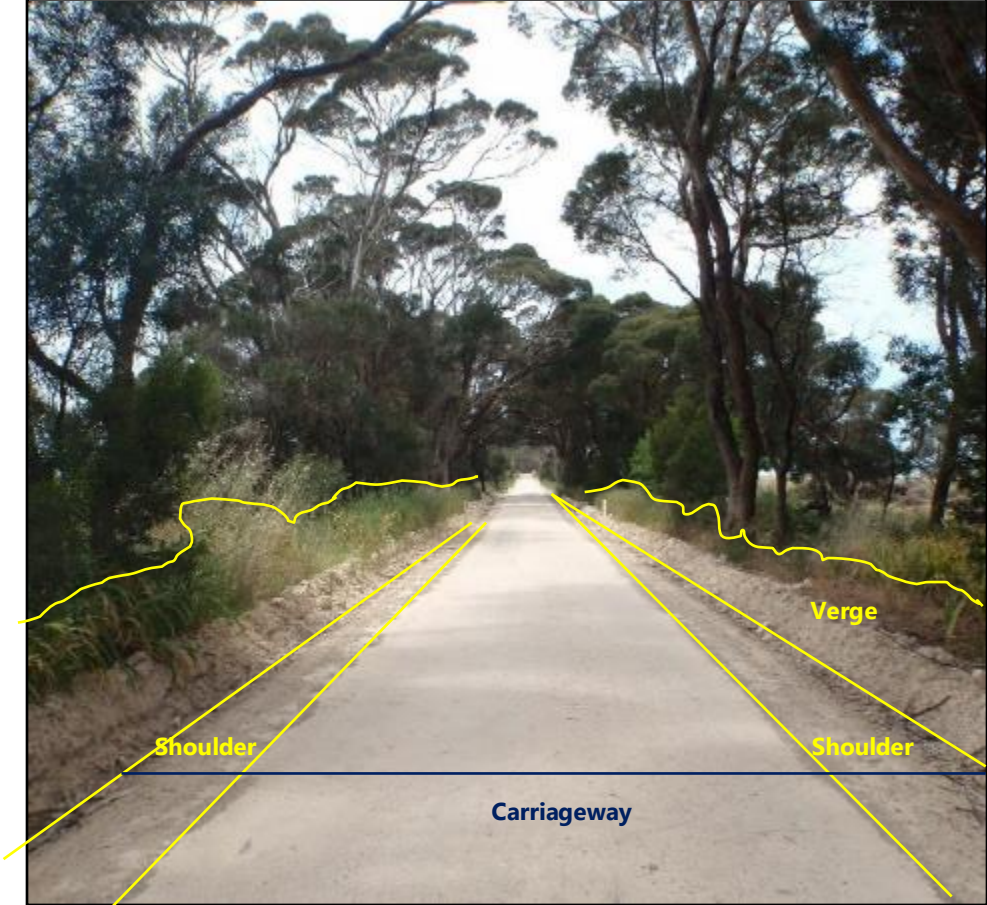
Typical breakdown of a dirt road, where shoulder and verge size do change.
